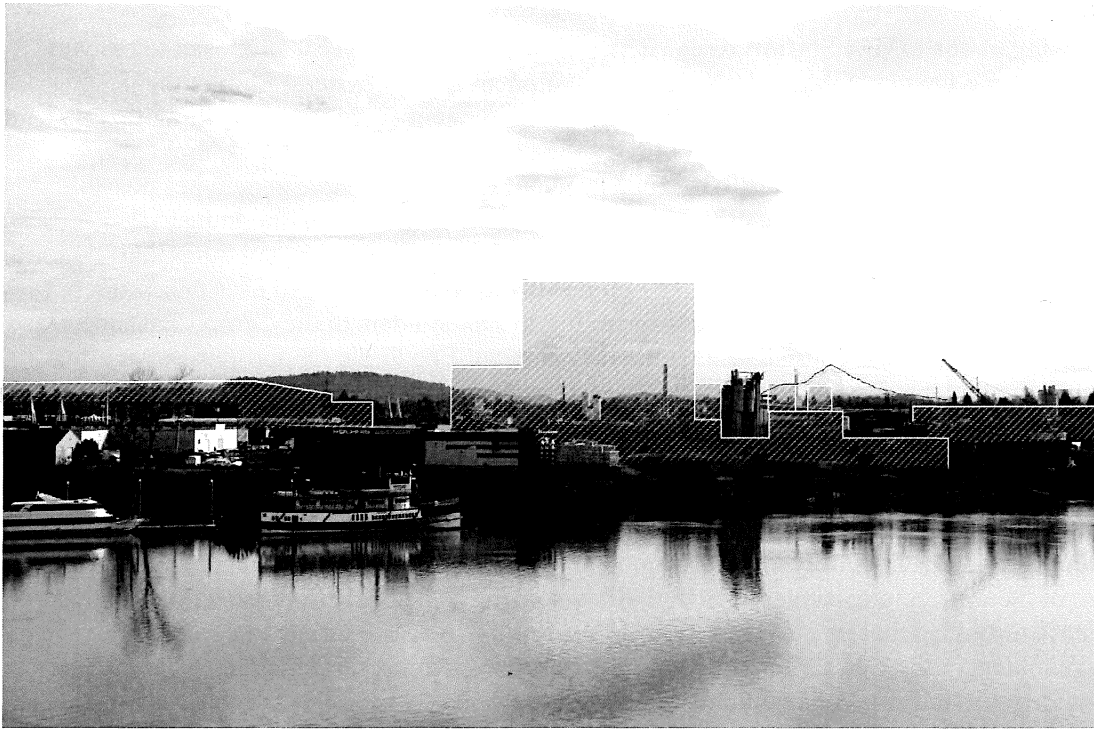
View of Mt Hood from SW46 – Existing Maximum Building Heights
